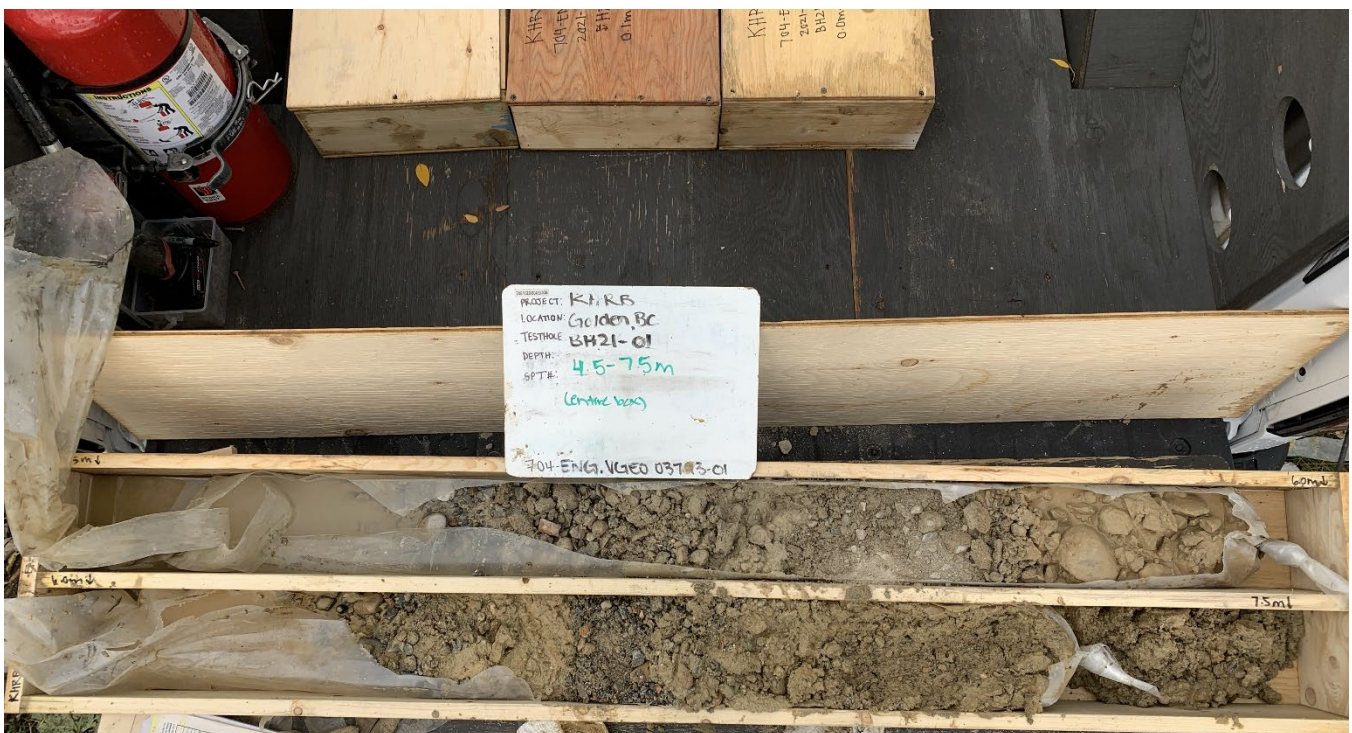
BH21-01, Box 2, 4.5 m to 7.5 m
